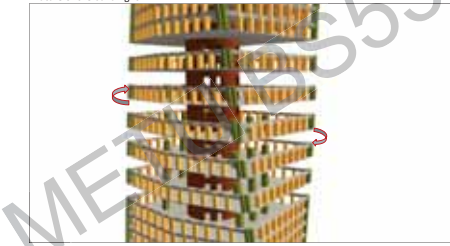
Floor twist of Cayan Towers, drawn by Fatih Topak
